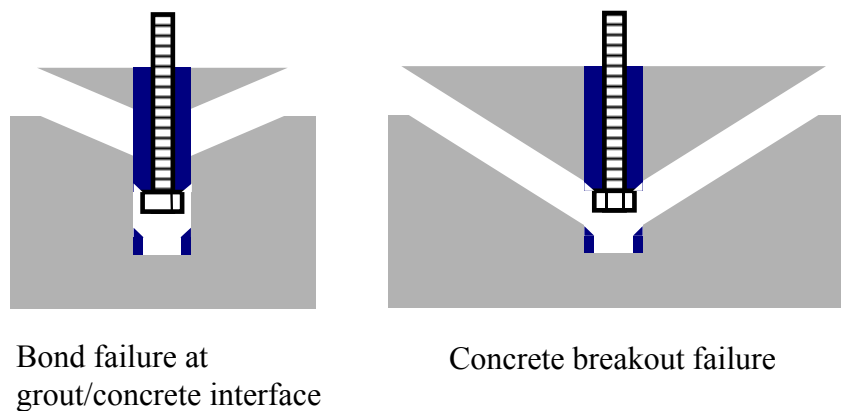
Typical bond failure at the grout/concrete interface and concrete cone breakout failure of headed grouted anchors
